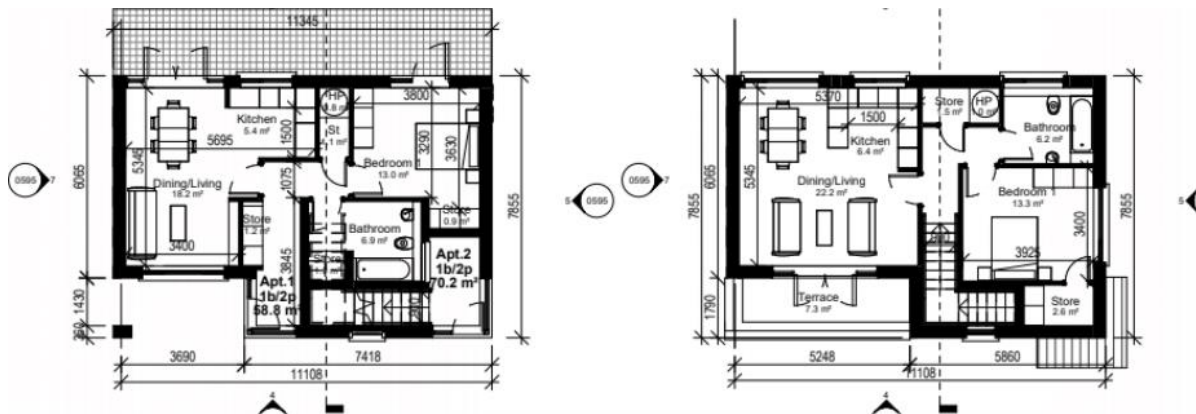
Proposed ground (left) and first floor (right) plans of Duplex Type G
